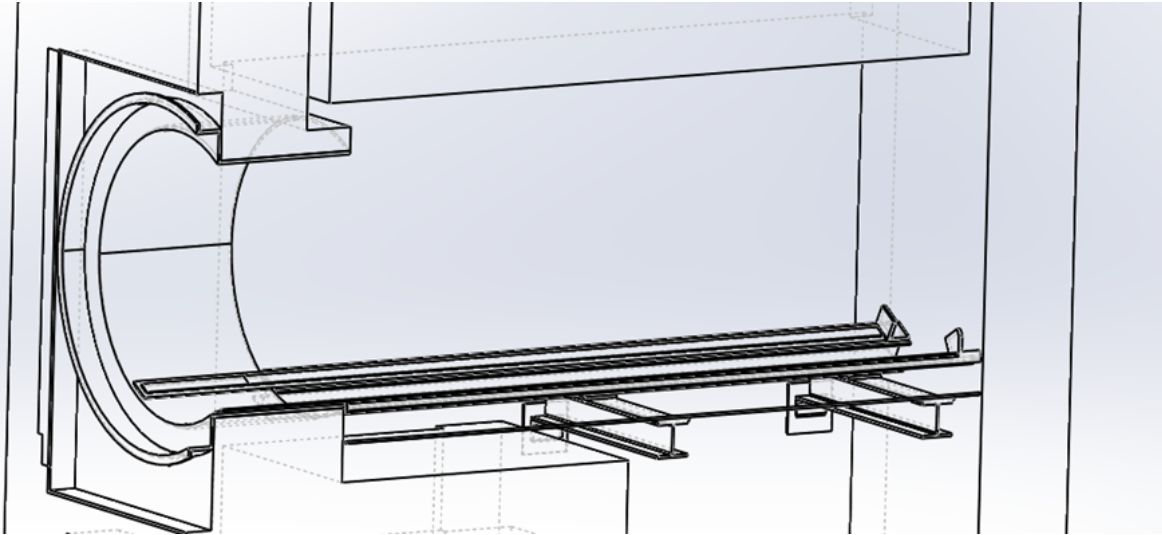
Horizontal spent fuel dry storage canister resting on steel rails inside concrete overpack (Meyer et al. 2013).
